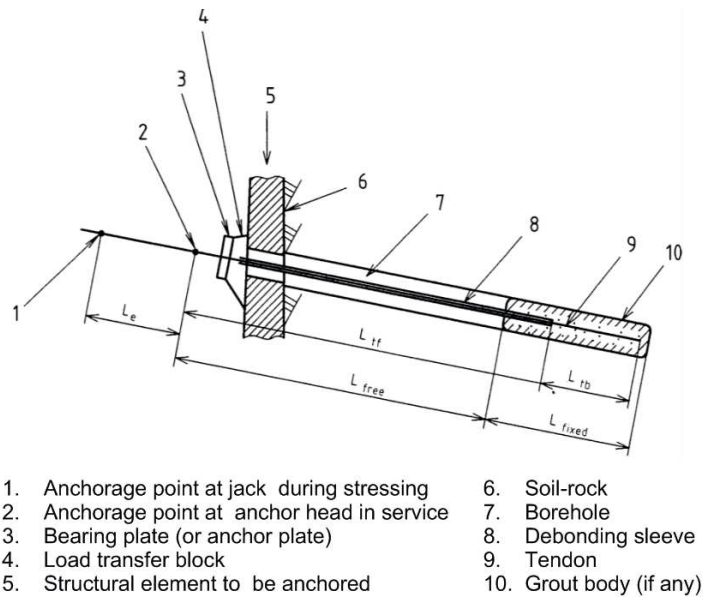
Sketch of a grouted ground anchor (EN 1537:1999).
